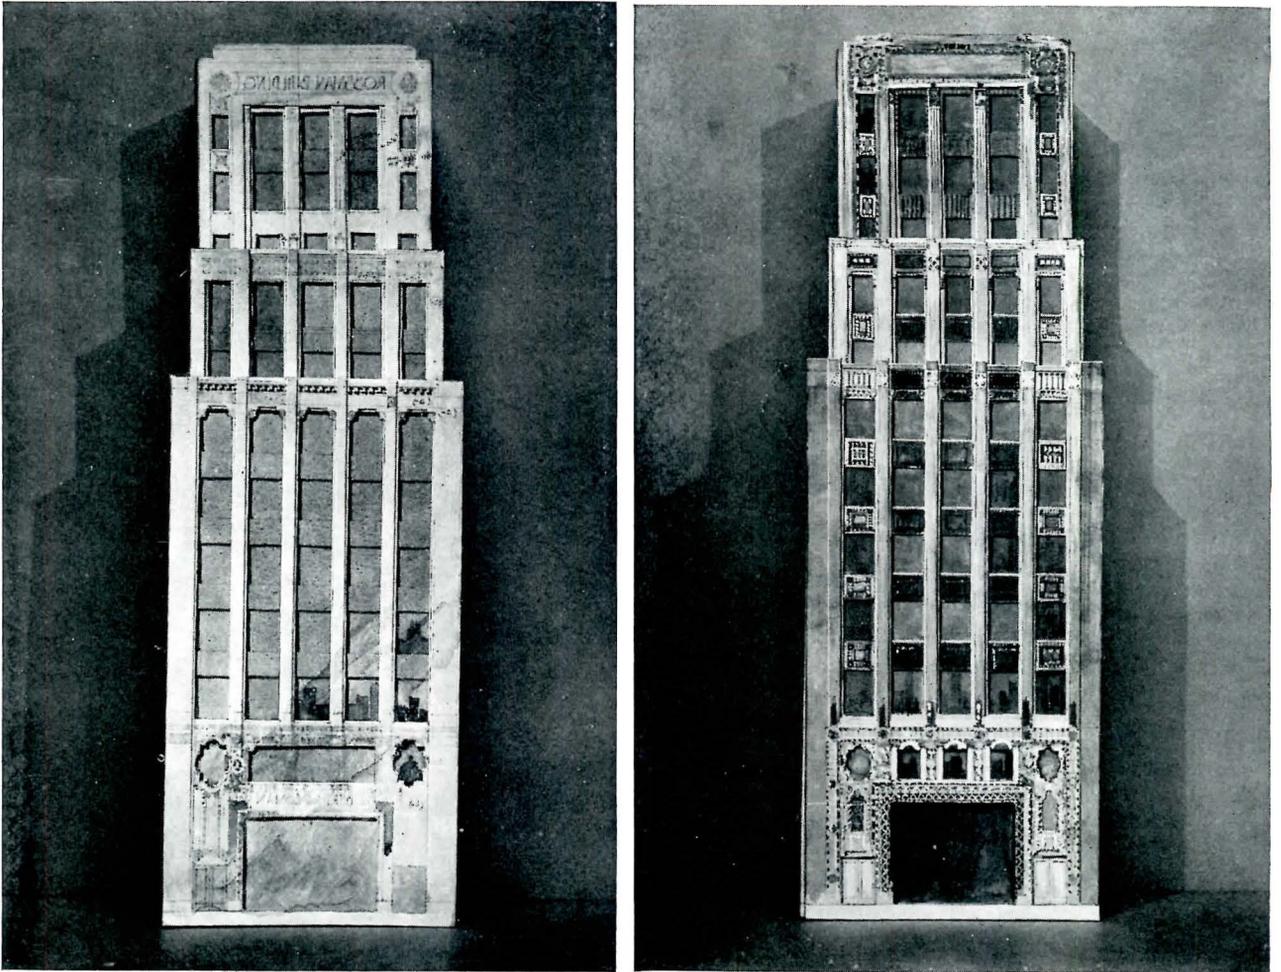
STUDIES OF BUILDING FOR TILE MANUFACTURERS, MADE OF LIGHT ILLUSTRATION BOARD
